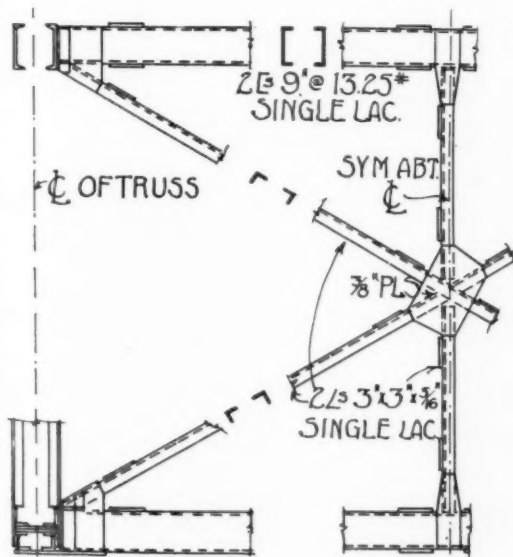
Vertical bracing between trusses, placed at panel points 2-5. See Fig. 7.
